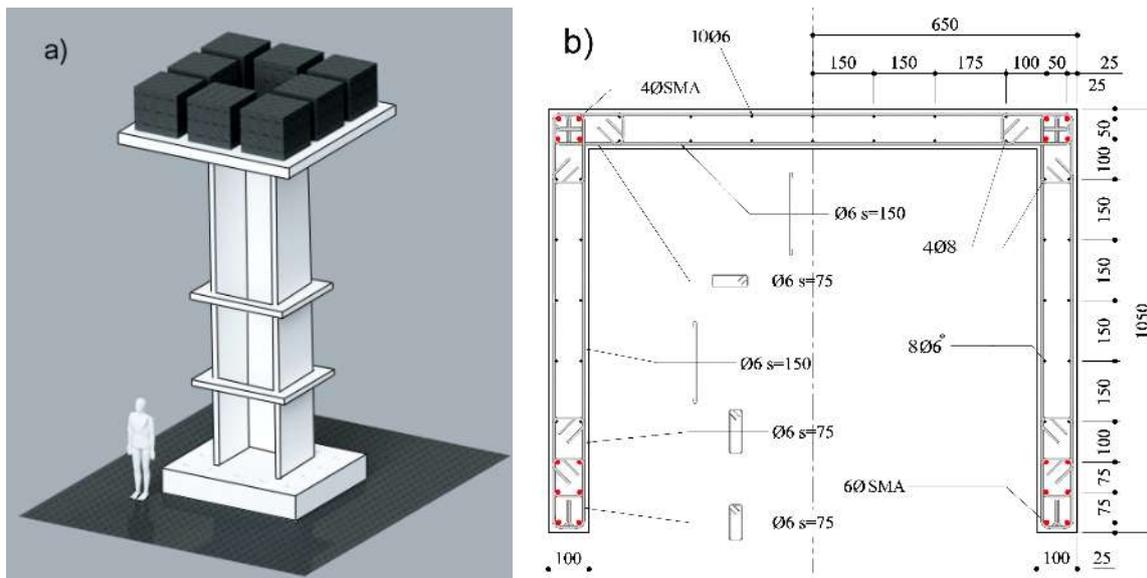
Preliminary proposal of the RC+SMA U-shaped wall unit to be tested as part of the ALL4wALL project, funded by ERIES (a) elevation 3-dimensional view (b) geometry and reinforcement detailing of the 1:2 scaled unit
